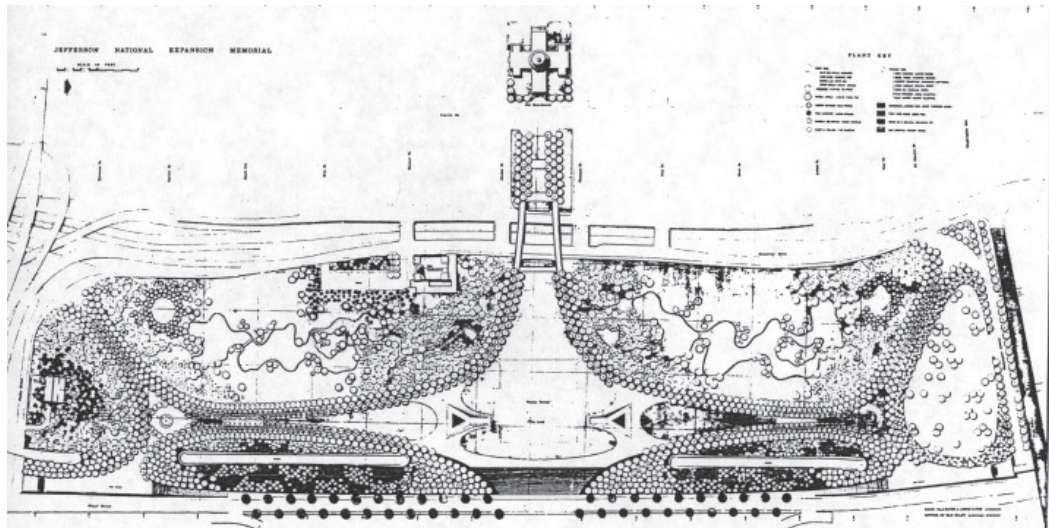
Office of Dan Kiley, Final Conceptual Planting Plan, 1964, approved by NPS, February 1966.
